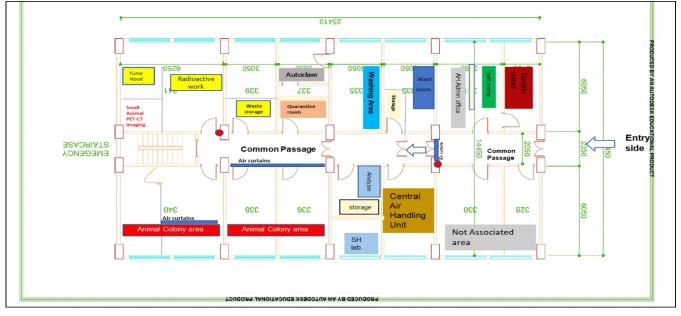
Modified layout of the Animal House Facility at RMC (BARC), Parel.
